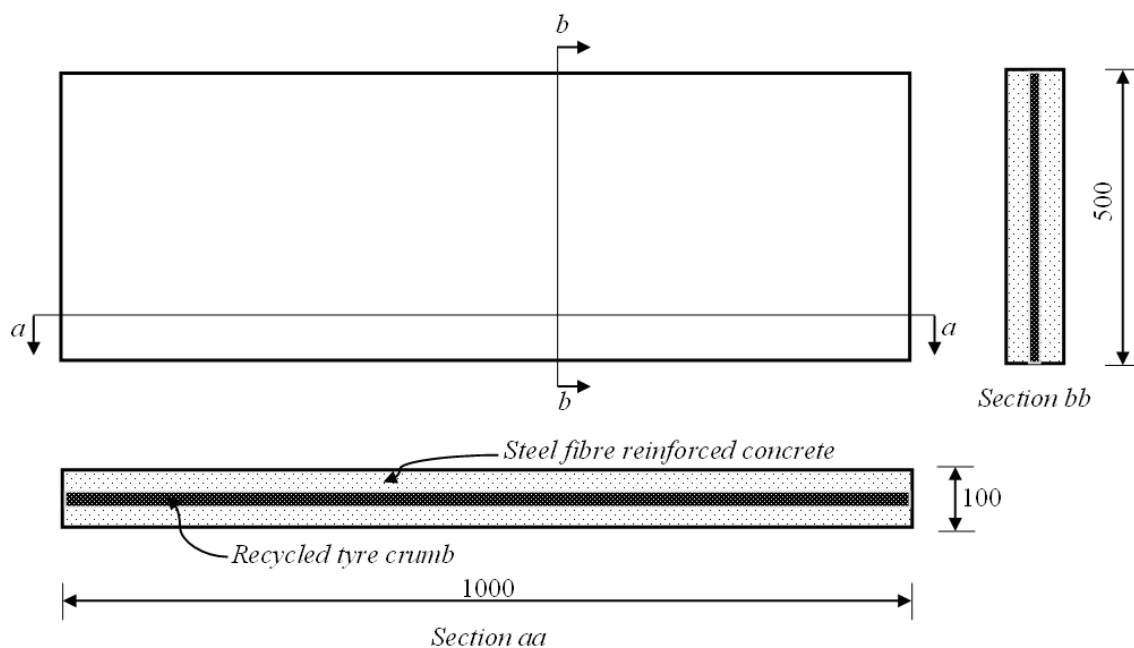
Geometric details of precast concrete sandwich panel (All dimensions are in mm)
